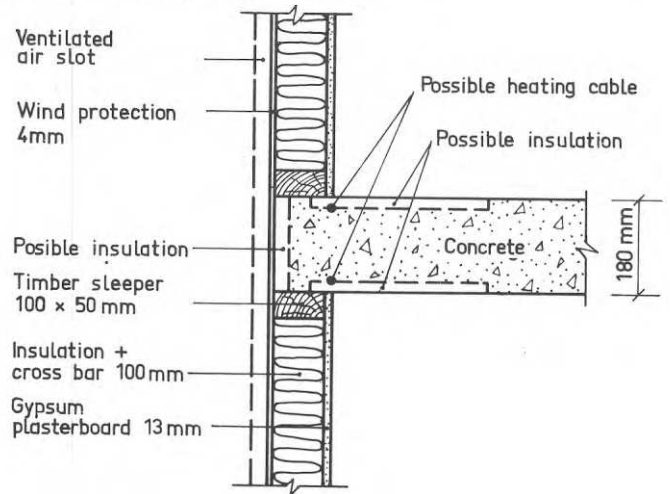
Design at external wall in skeleton construction, with ventilated external facade. The design is defective, inter alia with regard to the moisture barrier.
